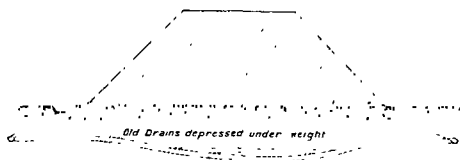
Section through Railway Embankment, showing Depression of Drains.
